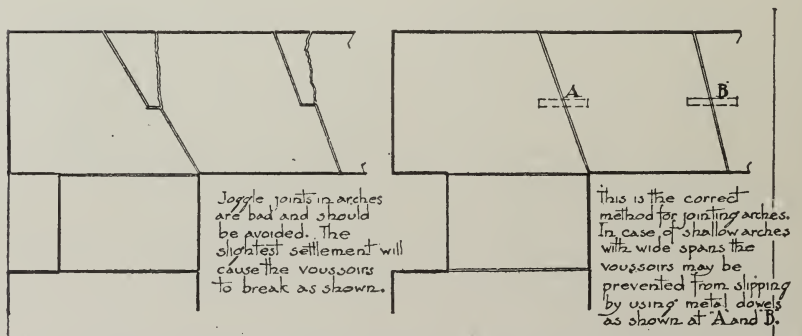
Terra-cotta Flat Arches. Bad and Good Construction.
